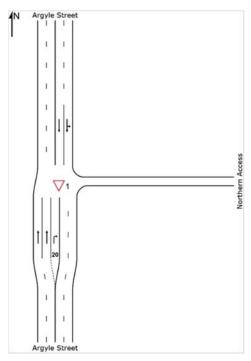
Northern Access and Argyle Street Intersection – Potential Layout
